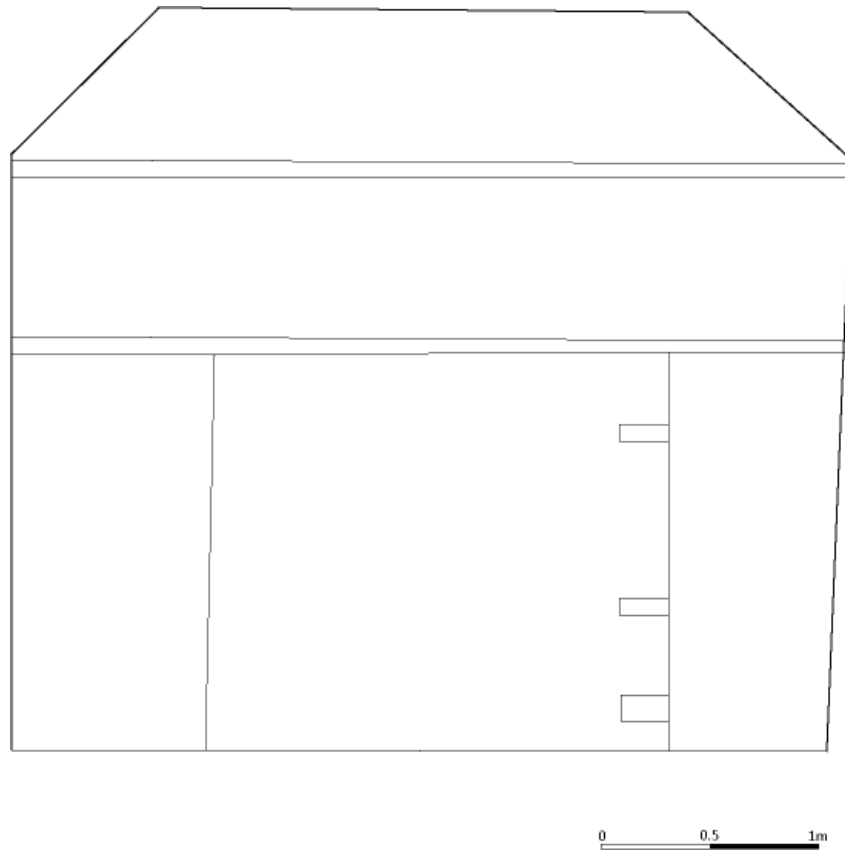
Internal cross-section of central compartment of printing works/workshop looking NW showing partition wall and flanking doorways
